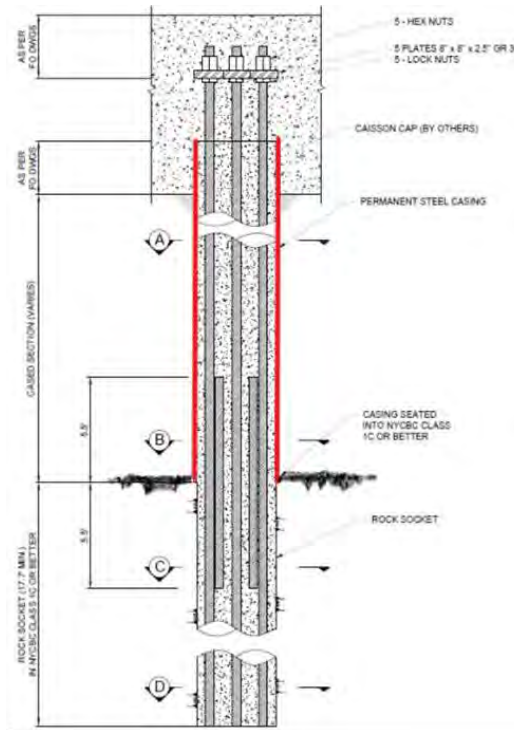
Schematic Longitudinal Section of a Caisson Pile
